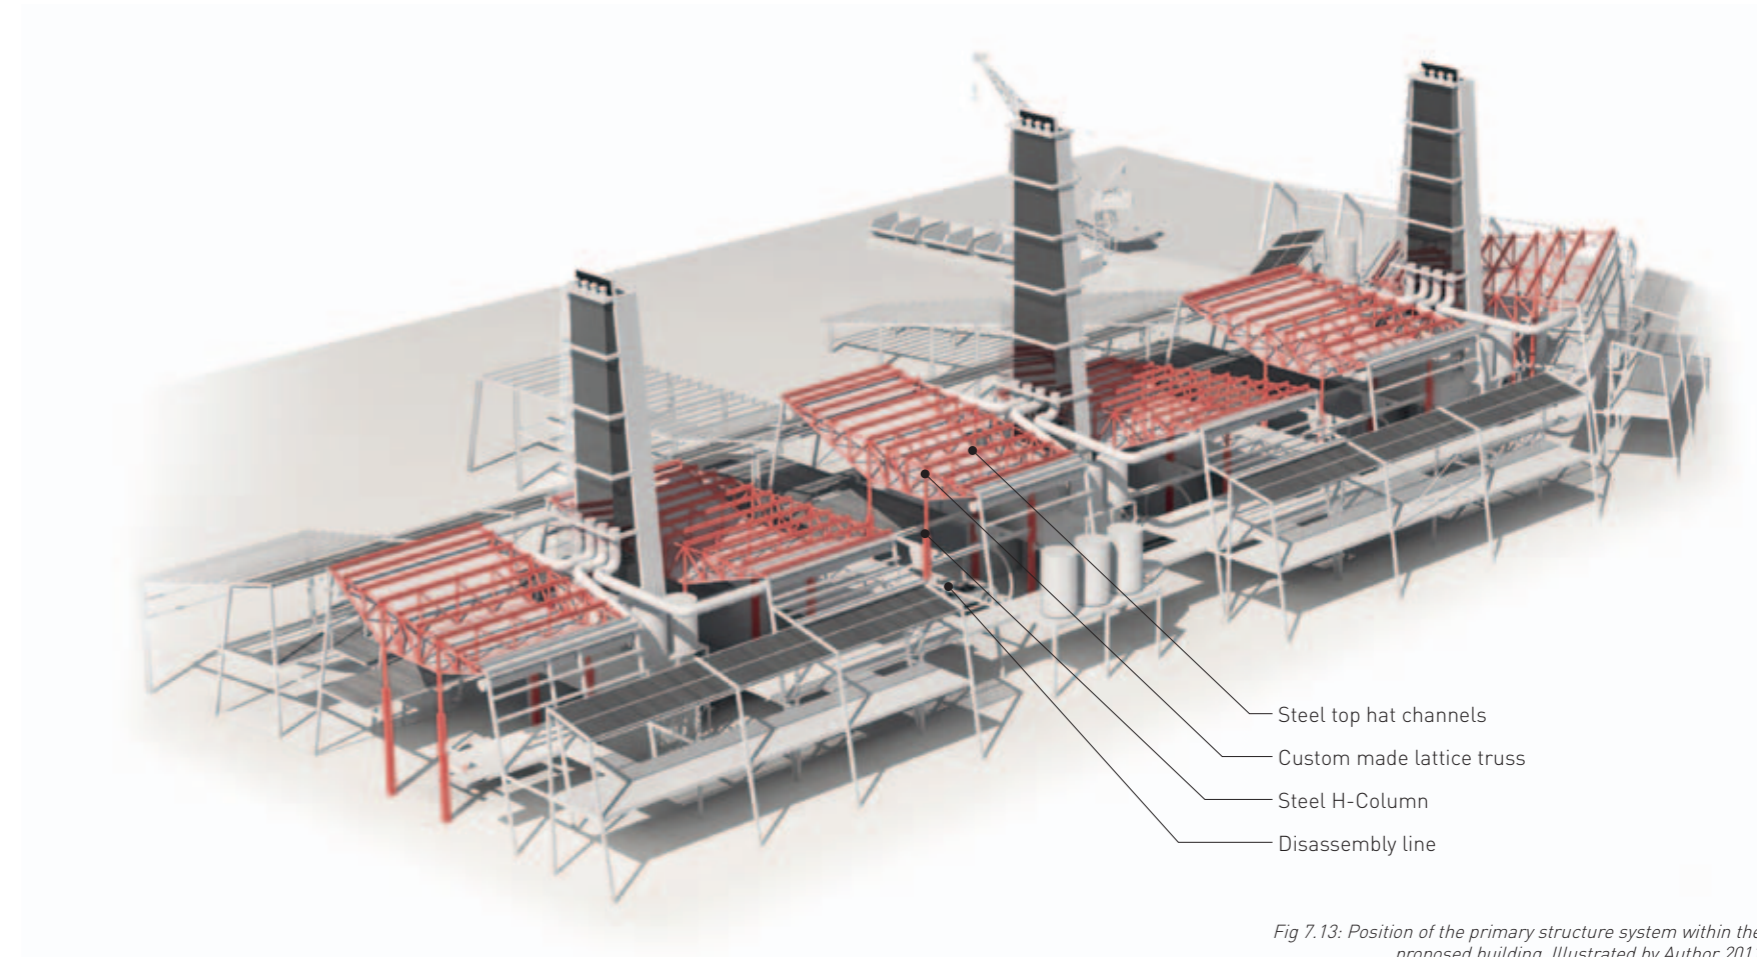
Position of the primary structure system within the proposed building, Illustrated by Author 2011
